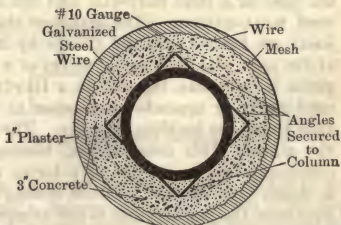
Fireproofing of Cast-iron Column with Concrete and Plaster
